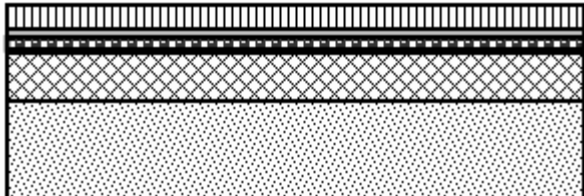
Heating cooling floor with plane section system type D, with floor surface covering, screed material, plastic plane section boards, and building structure (EN1264-2)
